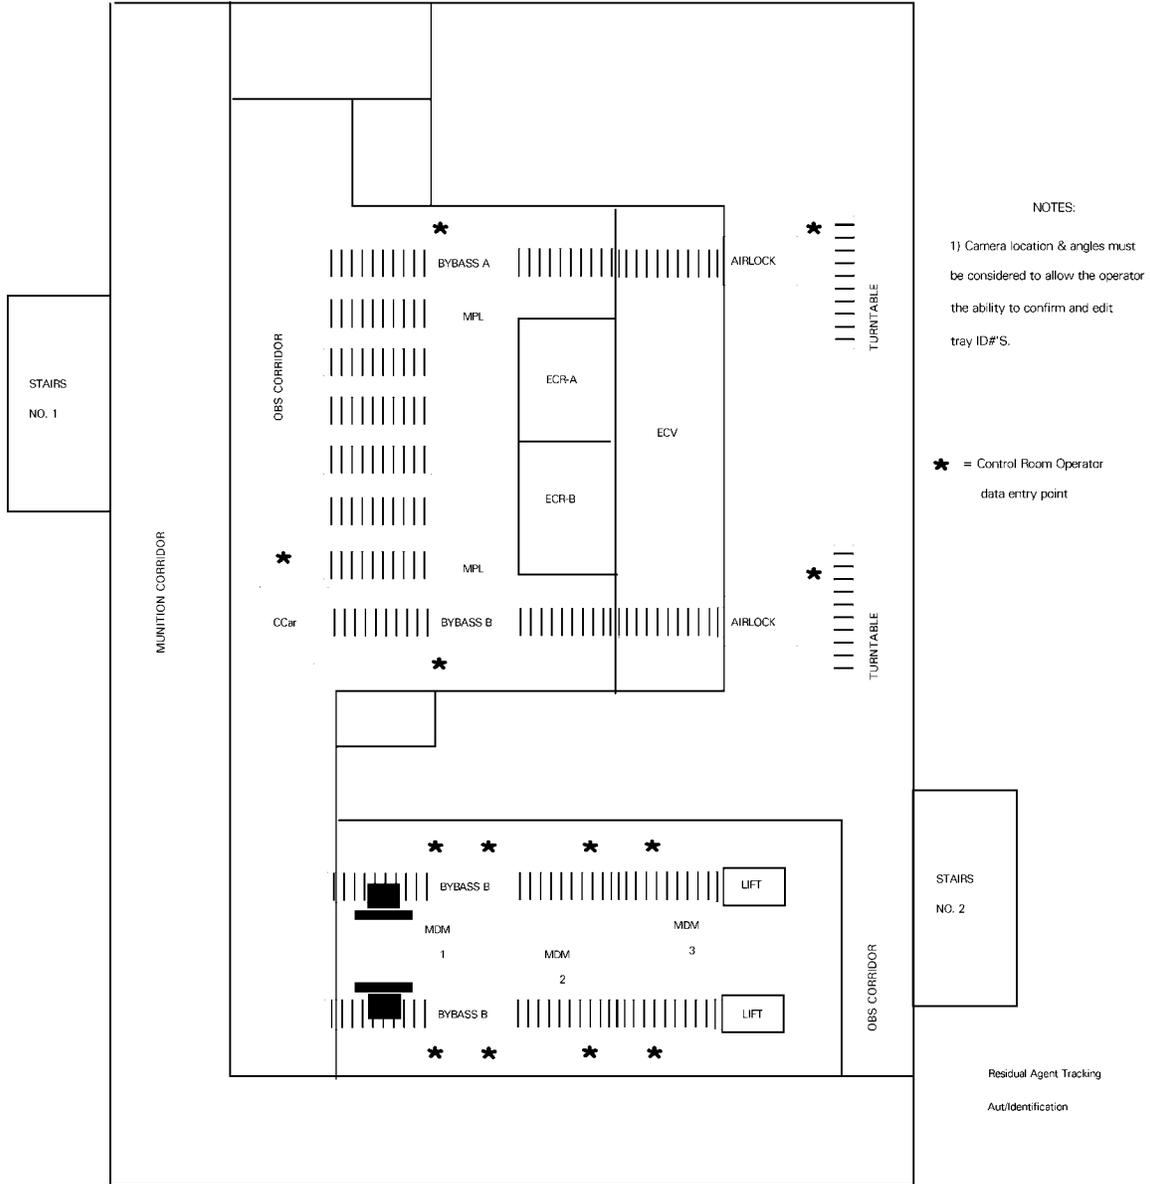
TOCDF MDB 2<sup>nd</sup> Floor Station Locations
